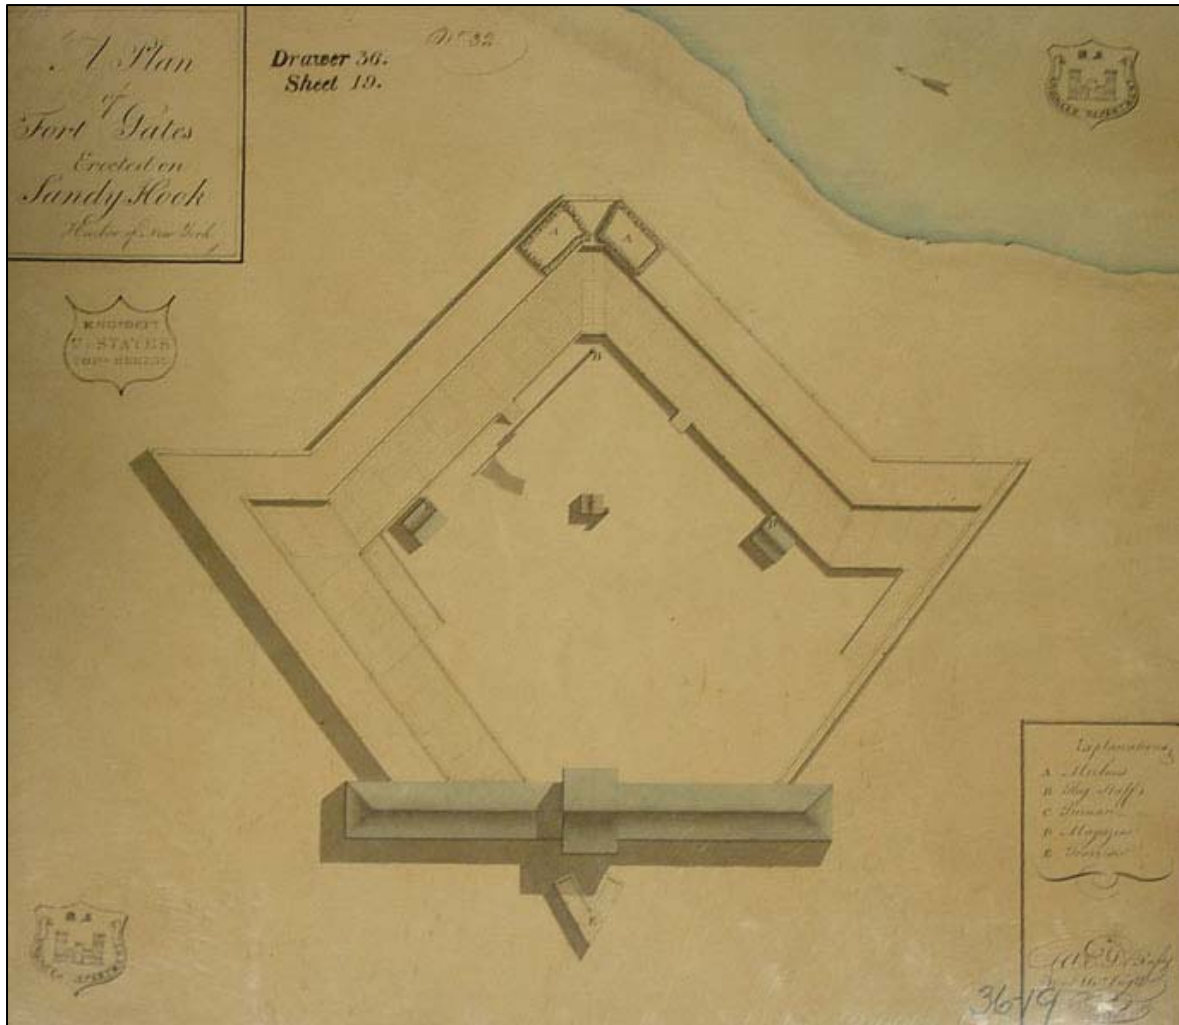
Plan of Fort Gates (constructed ca. 1812); structure was built of wood and located about half a mile north of the Sandy Hook Lighthouse. Fort Gates was the most noteworthy structure built during the War of 1812, and was constructed to deter the British from using Sandy Hook as a staging area from which they could attack New York City.
